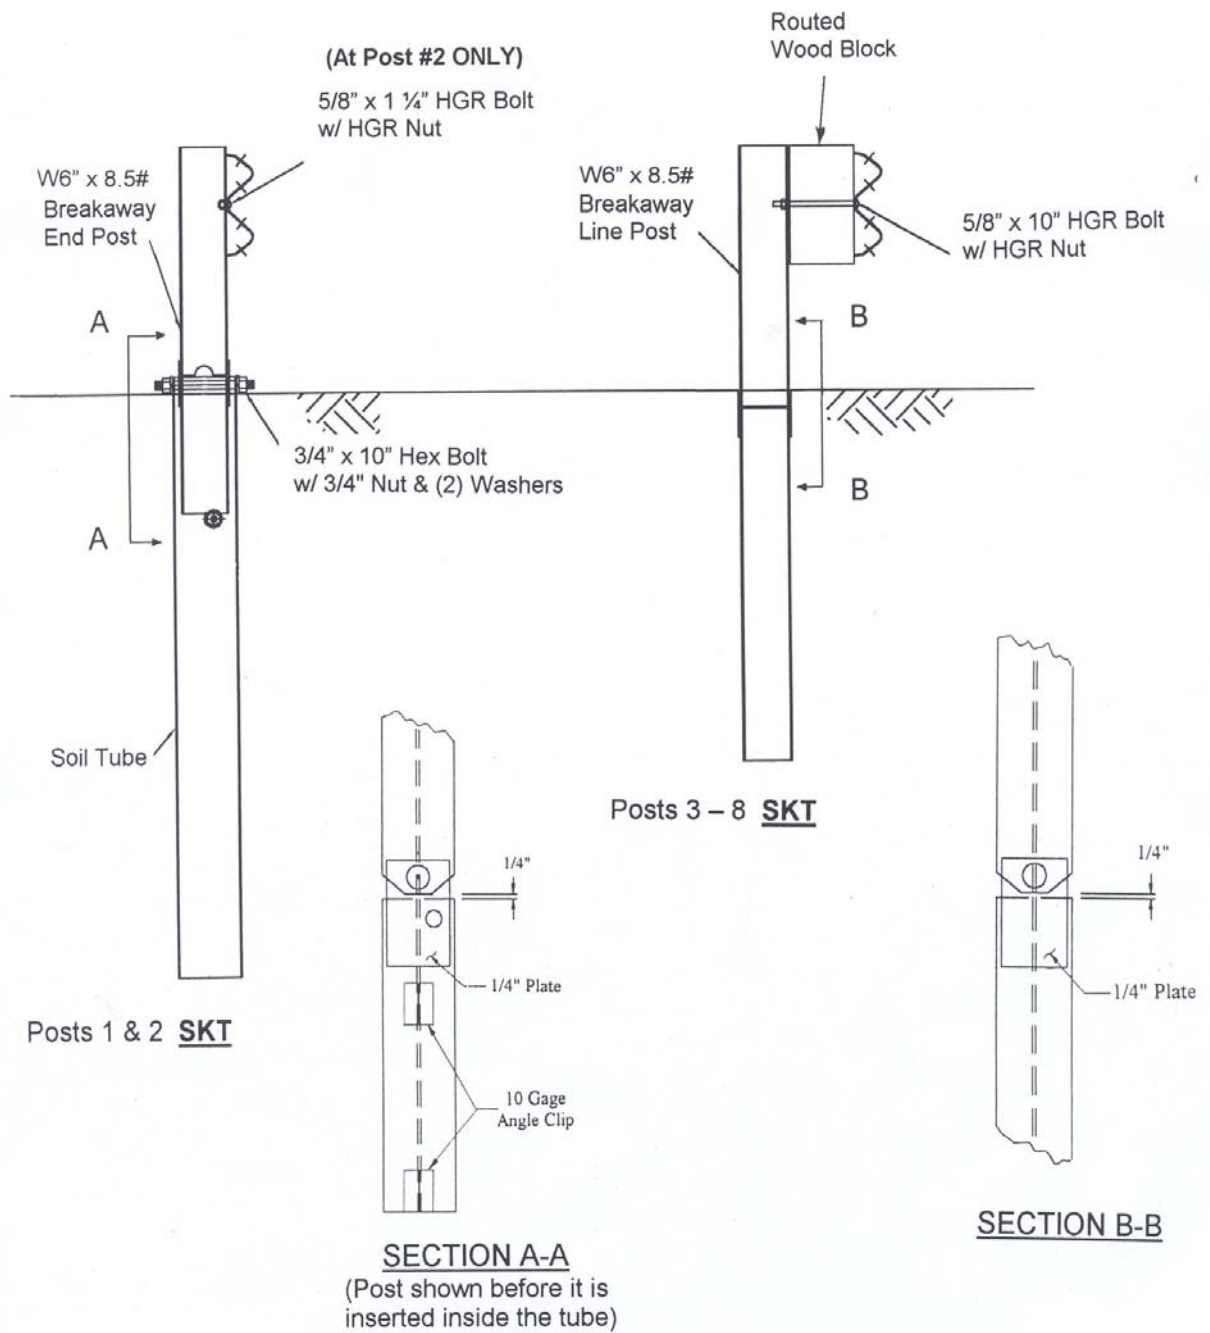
Section View of Plug Welded Steel End Posts and Line Posts
